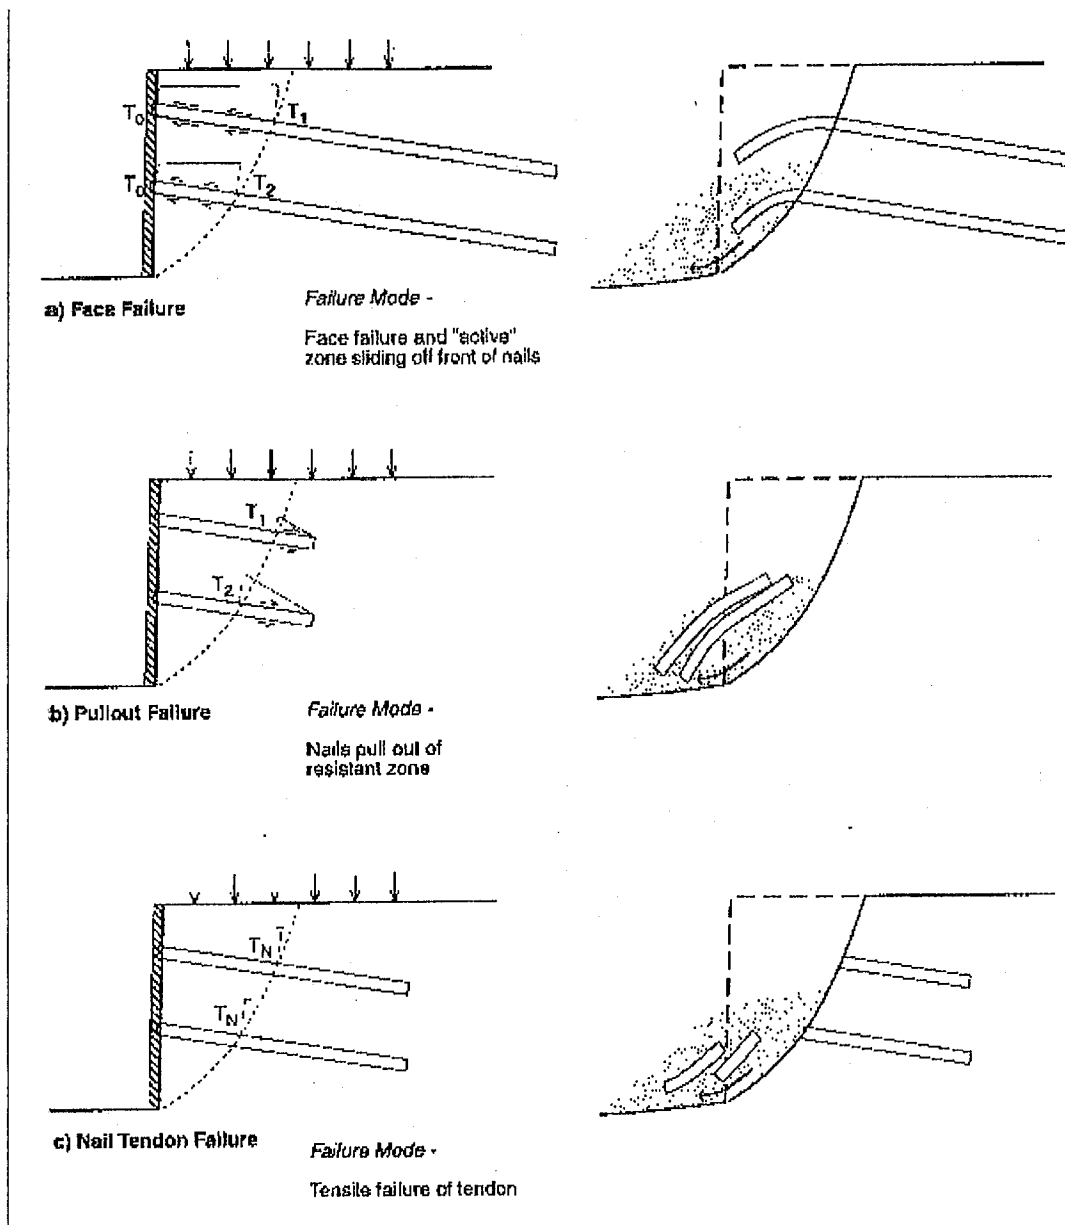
Potential soil nail wall failure mechanisms
